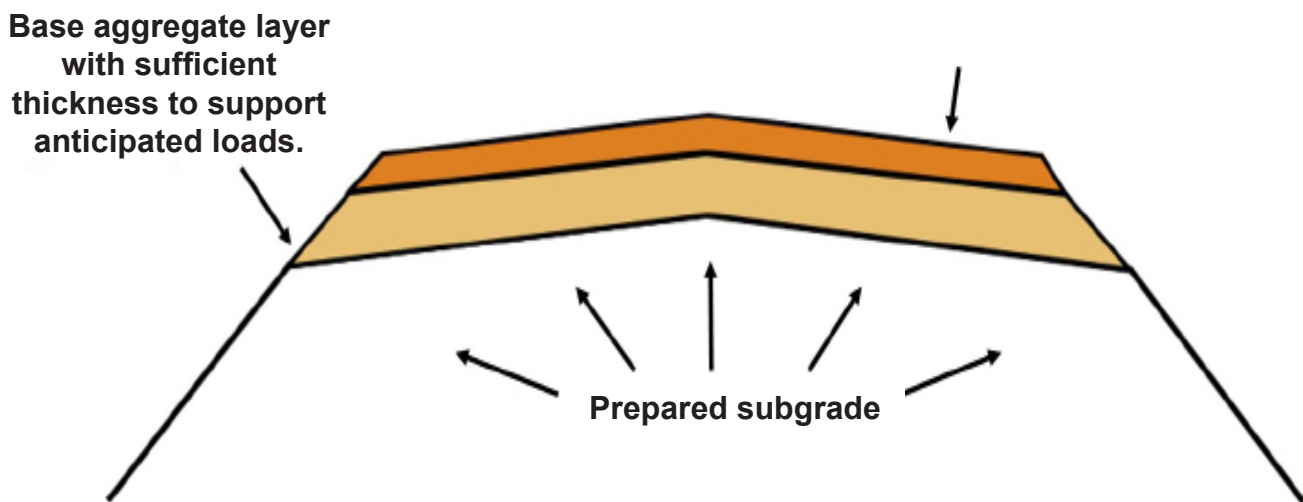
Roadway Layers: Example of building base and surface layers on a reconstructed gravel road. This may not be affordable, but will serve very well if significant truck traffic is expected.
